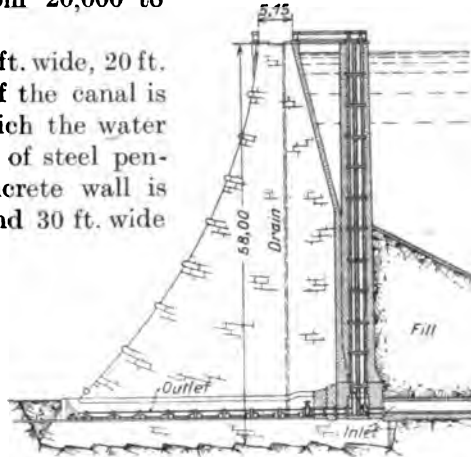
Section through Dam and Valve Chamber, Urftalsperre Plant, Germany.
